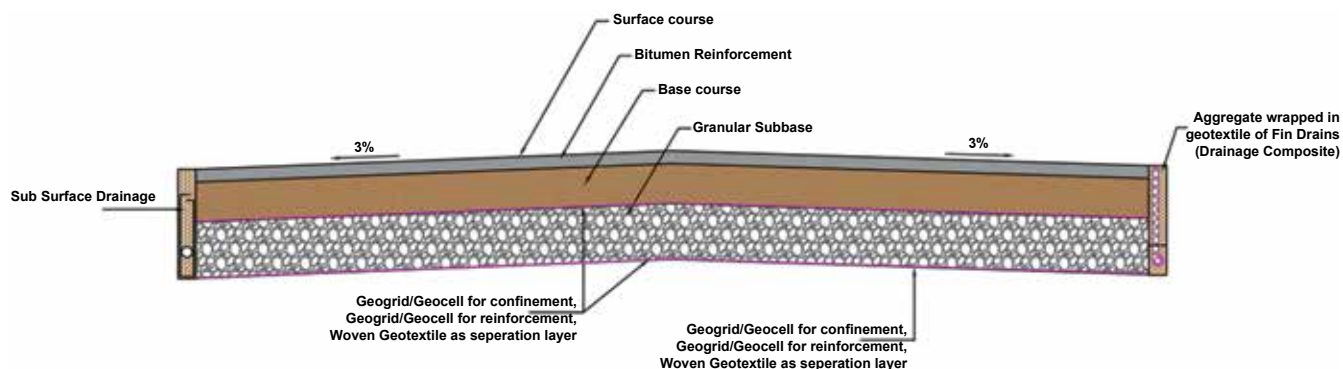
Potential Applications and Typical Location of Geosynthetics in Layered Pavement System
